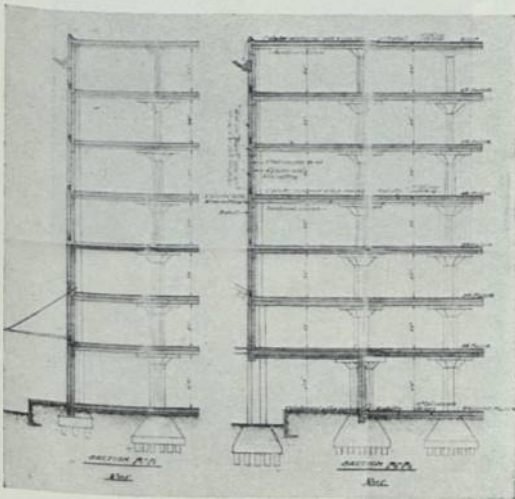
Cold storage house to be built in Cell Concrete in Australia
